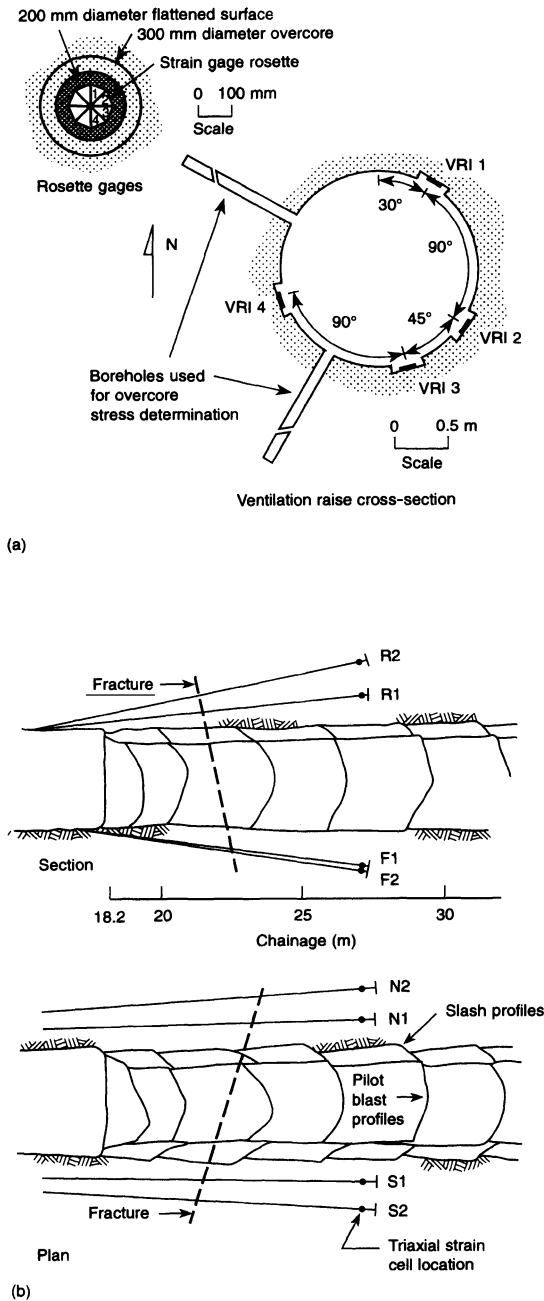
Rock mass relief tests at the URL. (a) Plan view of bored raise test configuration. (After Chandler, 1993.) (b) Longitudinal and plan view of the under-excavation technique used in the excavation of the 209 experimental drift at the 240 m level. (After Kaiser, Zou and Lang, 1990.)
